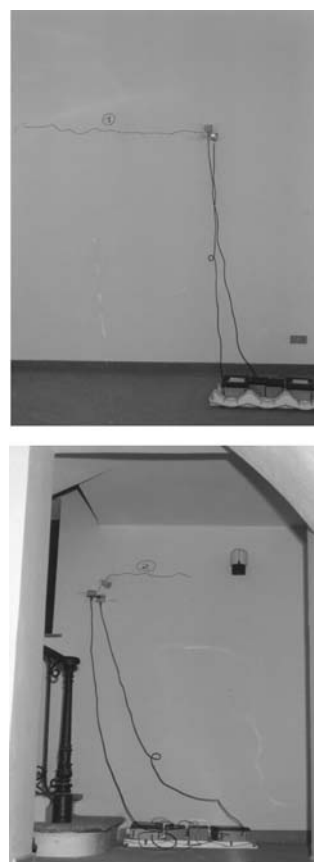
Cracks n. 1 and n. 2 in the inner wall; PZT transducers placed at the tip of the cracks and AE monitoring equipment
